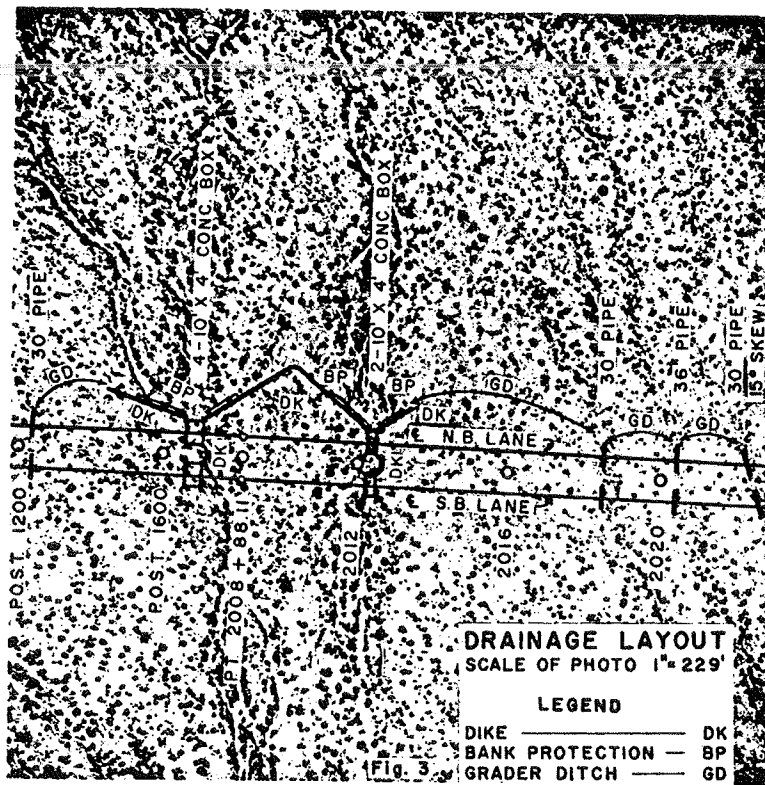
Drainage layout detailed on an aerial photograph showing method of placement of structures, dikes and other drainage features.
